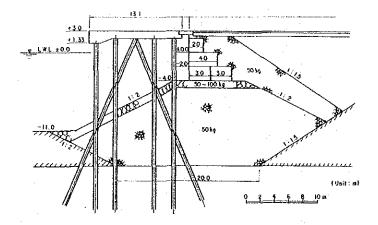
(3) Plan of Foundation Improvement Type Structure
